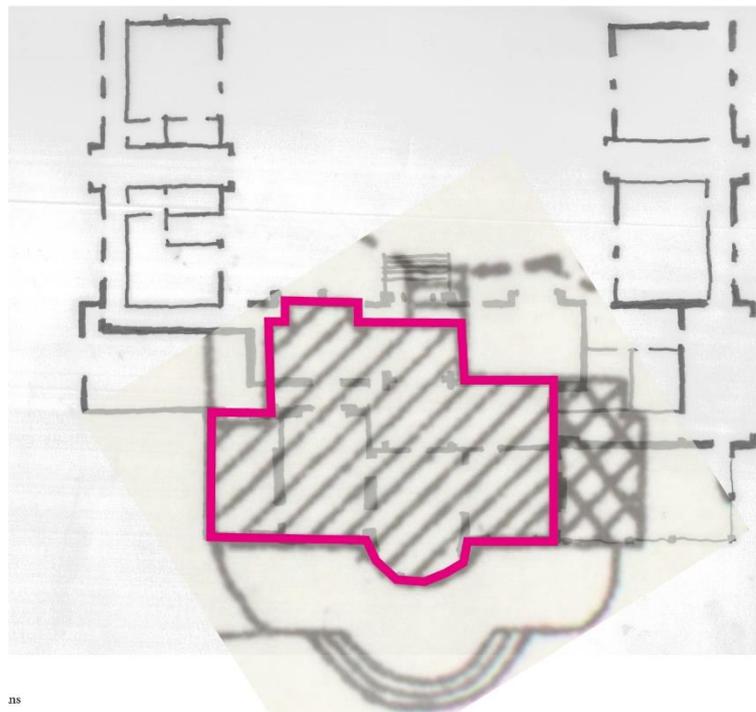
1903 Ordnance Survey Map overlaid with existing ground floor plan
